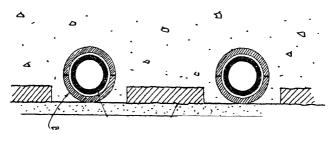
B.—'Panelite' Heating as applied to Concrete Slab.
